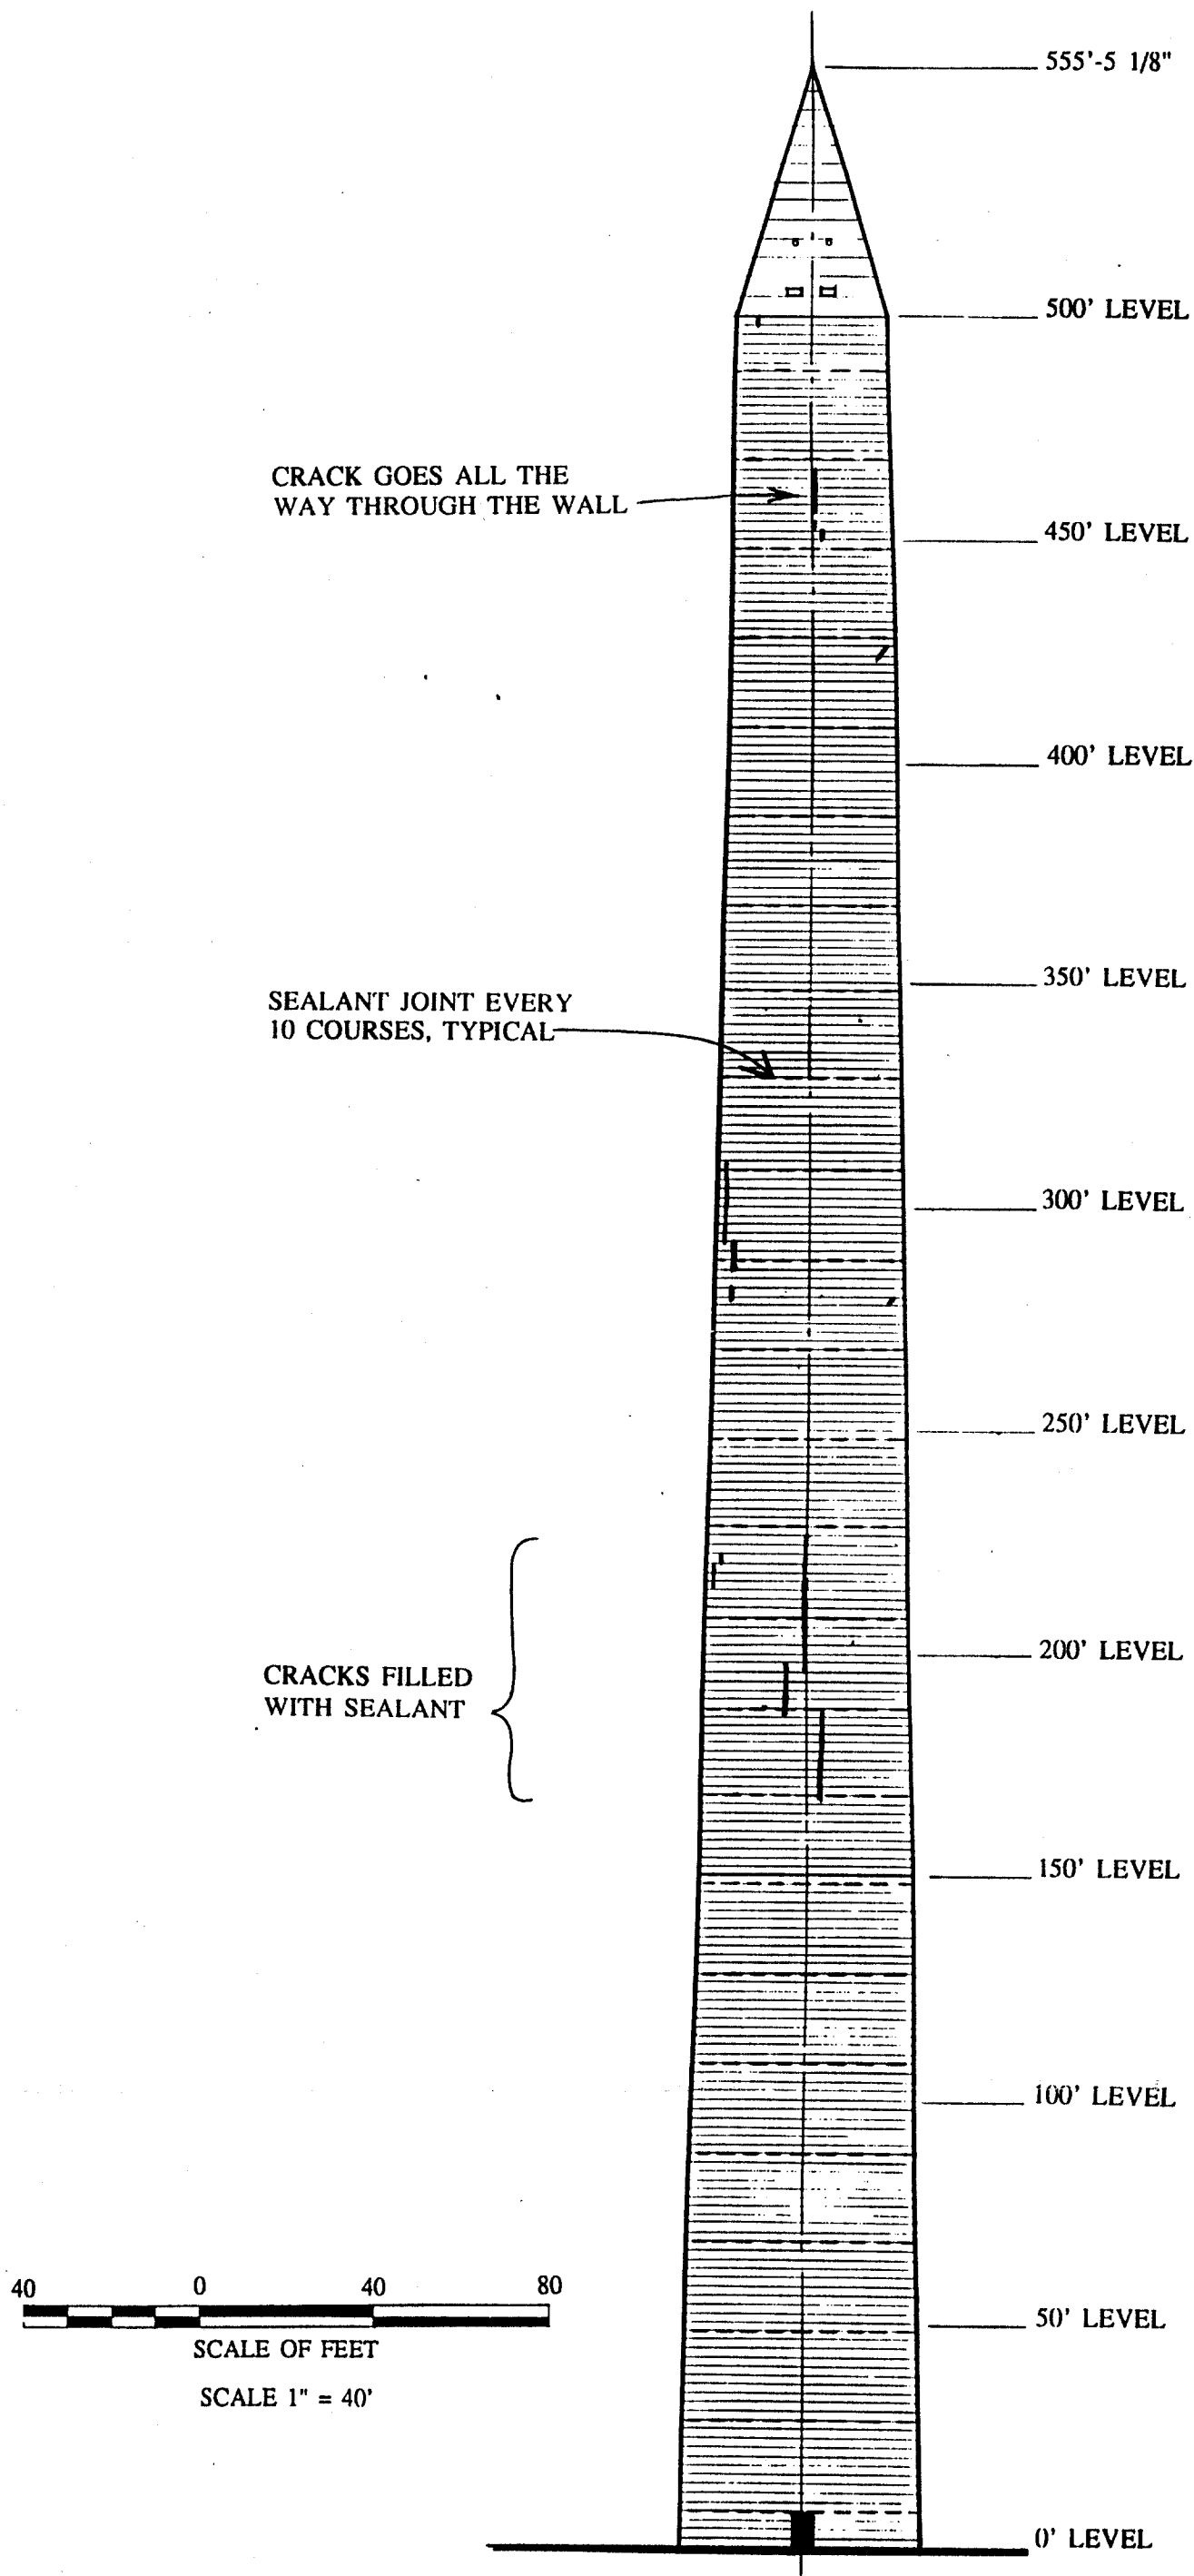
East elevation crack survey, April 23, 1992. The vertical lines indicate cracks which were visible from the ground using 10 x 25 binoculars. Drawing by Oehrlein & Associates Architects.
